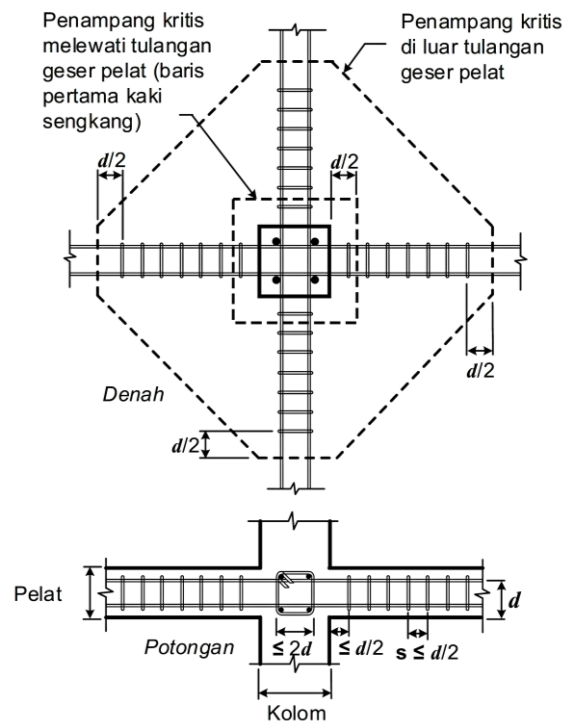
Arrangement of Shear Stirrups Reinforcement for Interior Columns (SNI 2847:2019)
